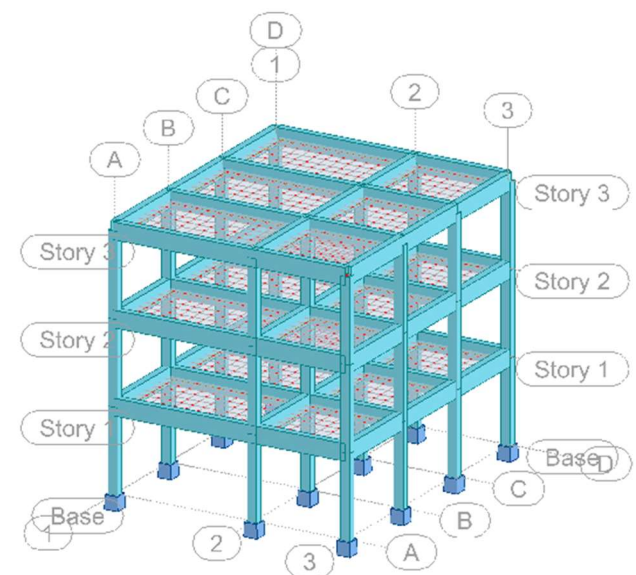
RSAP Model S: Reinforced Concrete Frame with Analytical Shell Element
